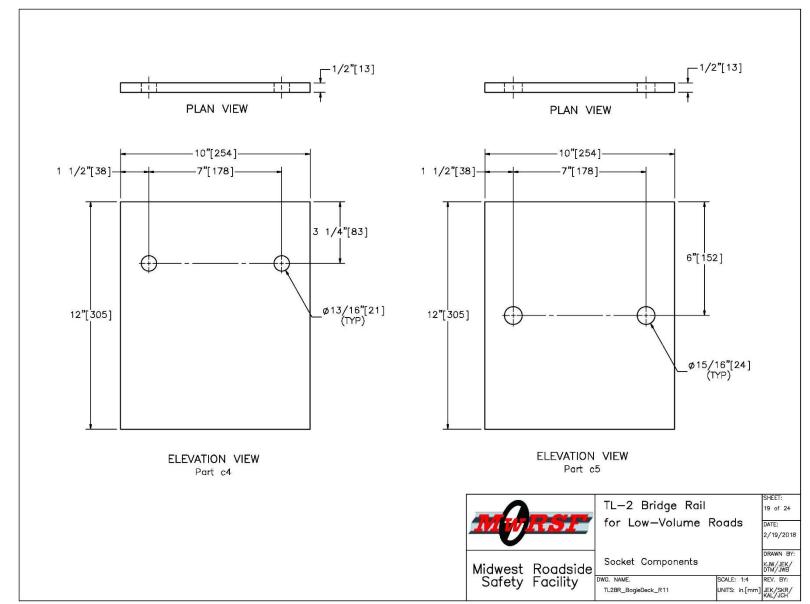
Bogie Testing Matrix and Setup, Socket Components
